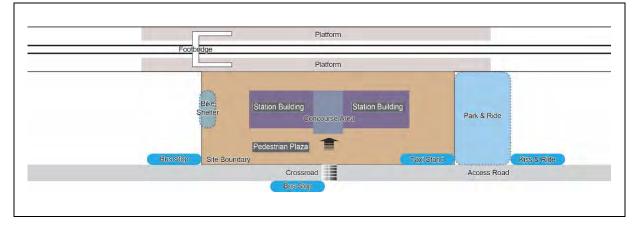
Prototype Site Plan of At Grade Type Medium Station
